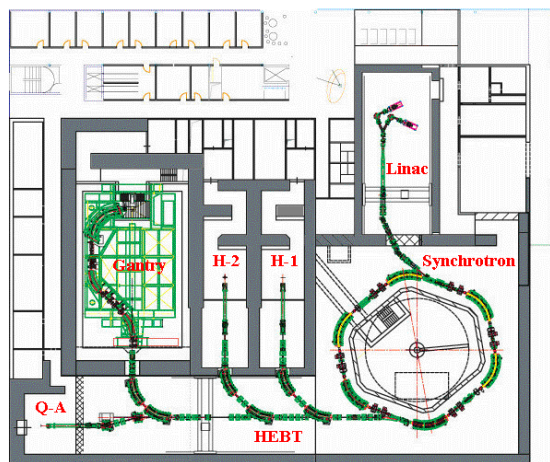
Layout of the first underground floor, housing the accelerator complex
